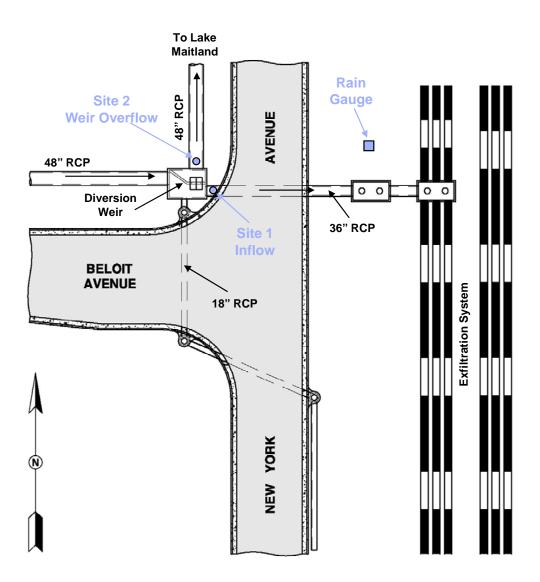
Locations for Monitoring Equipment at the New York Avenue Site.
